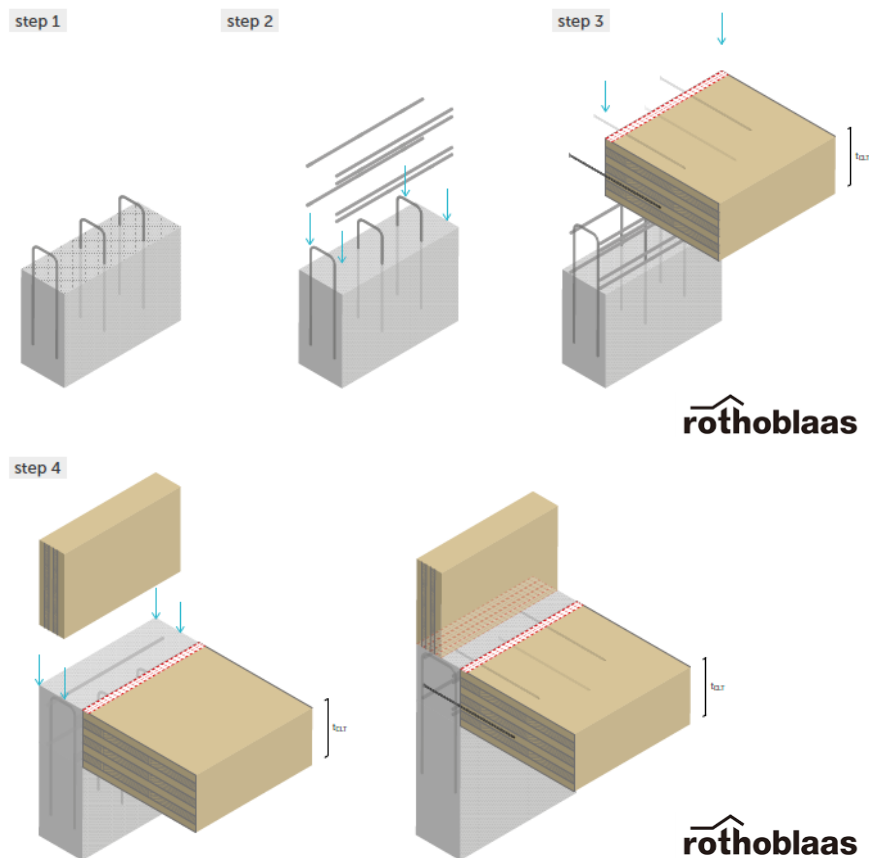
CLT slab to wall connection (copyright Rothoblaas)
